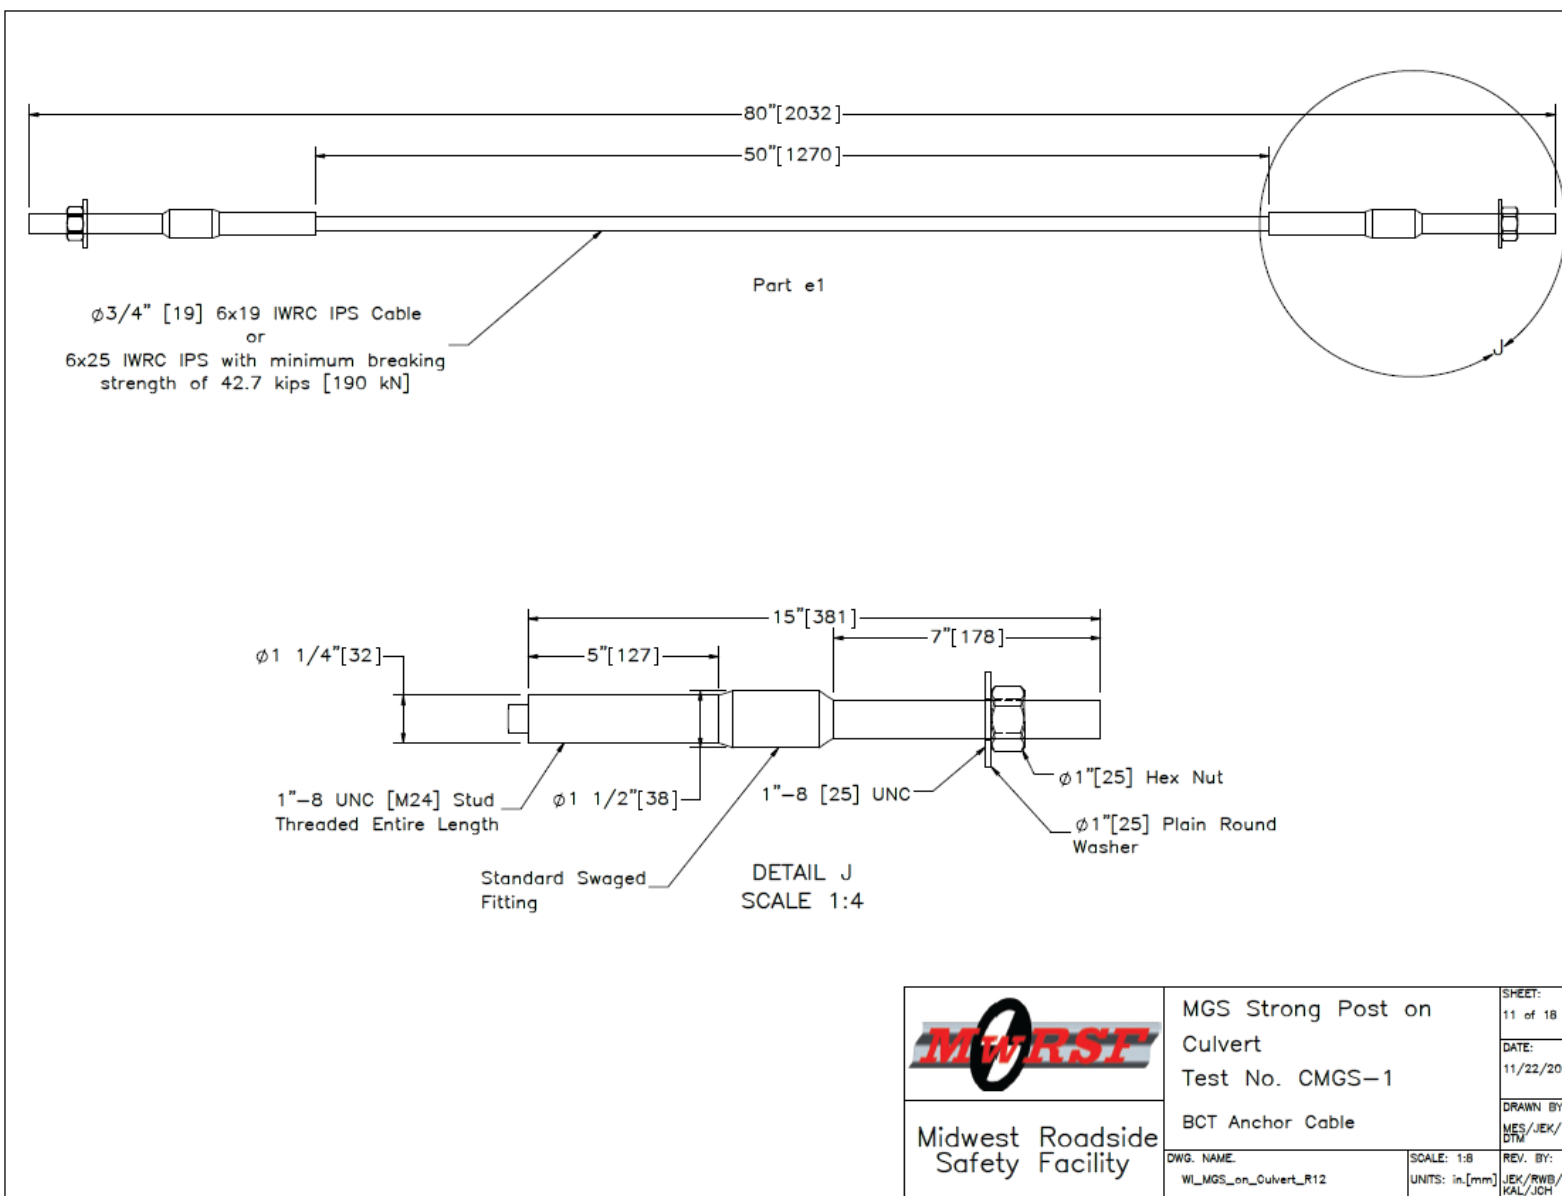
BCT Anchor Cable, Test Nos. CMGS-1 and CMGS-2
